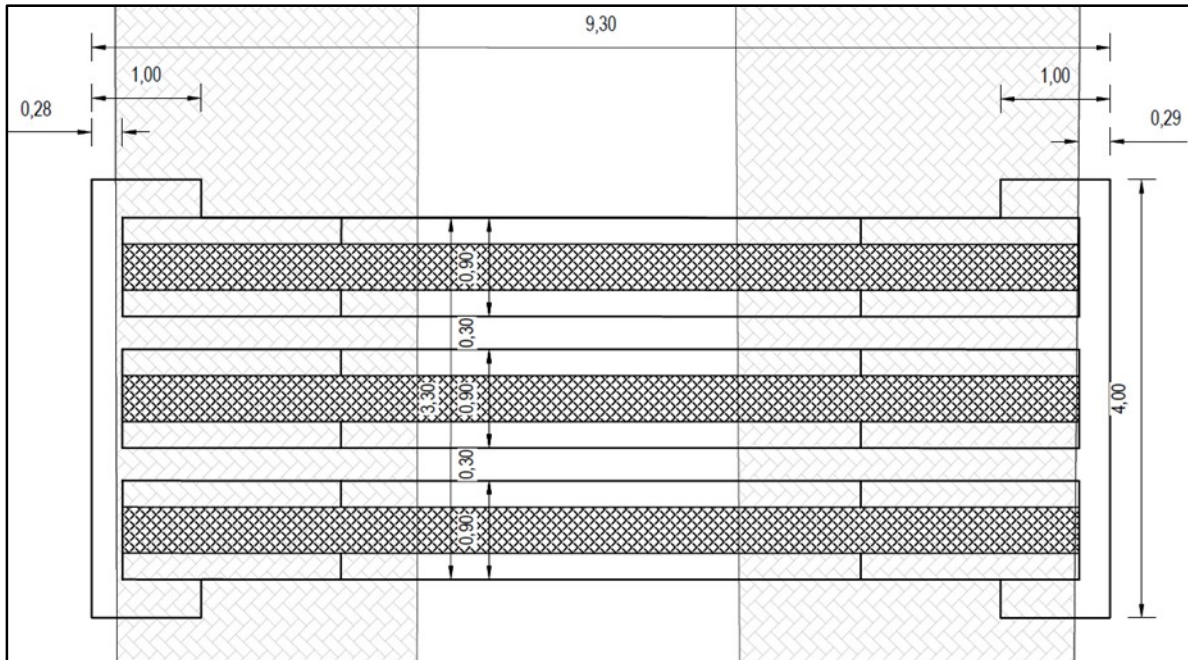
Plan view of proposed channels at railway crossing 1 between positions IAE SW1 and IAE SW2
